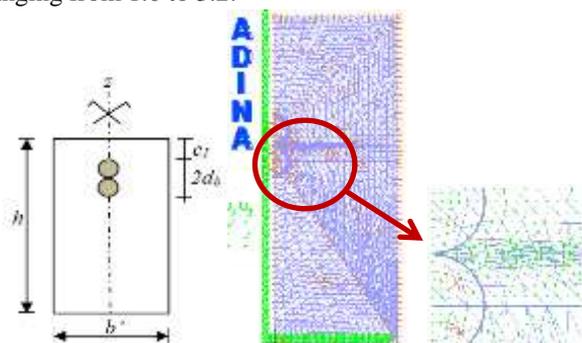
Geometry and mesh diagram of a cross section of concrete beam reinforced with two GFRP bars.
